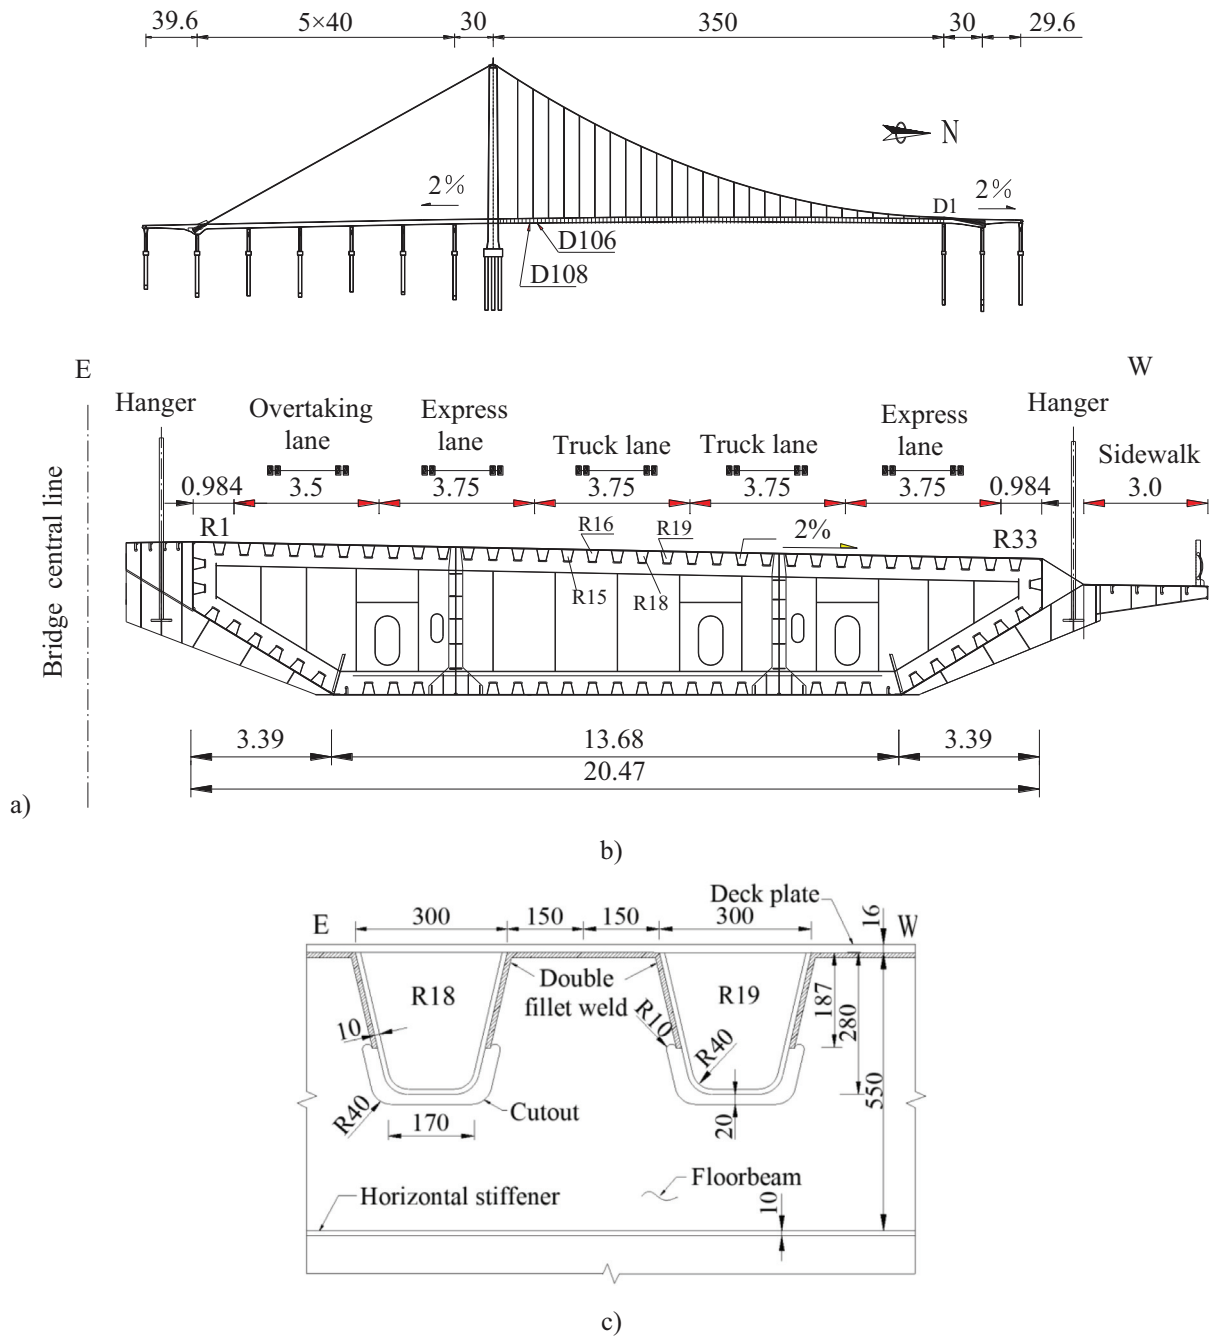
Pingsheng Bridge, a) elevation layout (Unit: m); b) cross section of steel box girder (Unit: m); c) OSD (Unit: mm).
